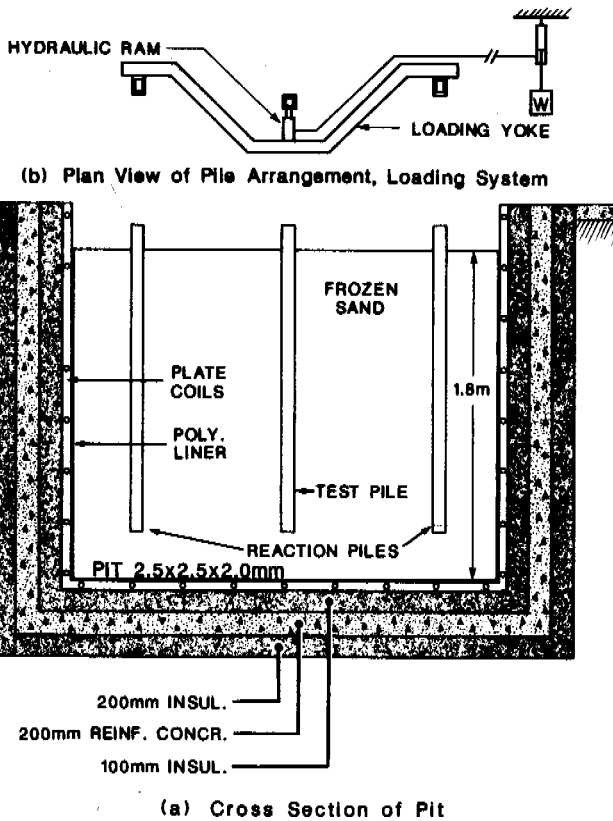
Test facility: (a) section through pit; (b) planview of pile arrangement and loading system.
